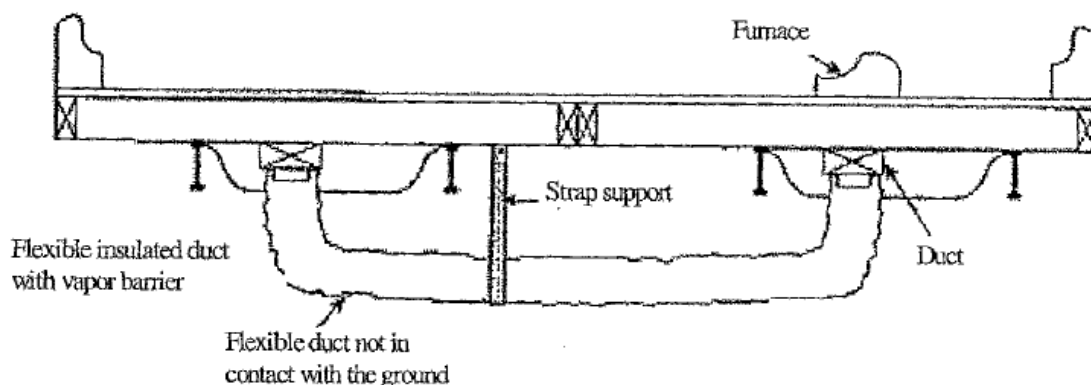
Crossover Duct Installation with Two Connecting Ducts.
